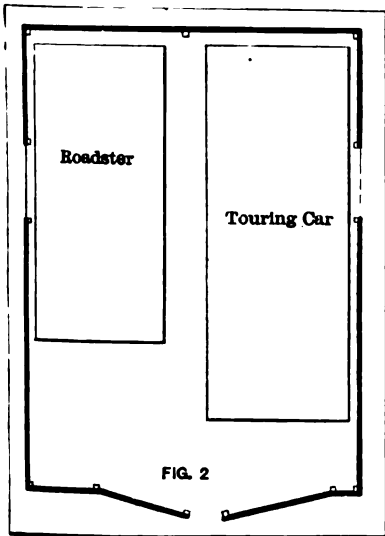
Floor plan showing a roadster, and a touring car on the floor, and the room that is left.
